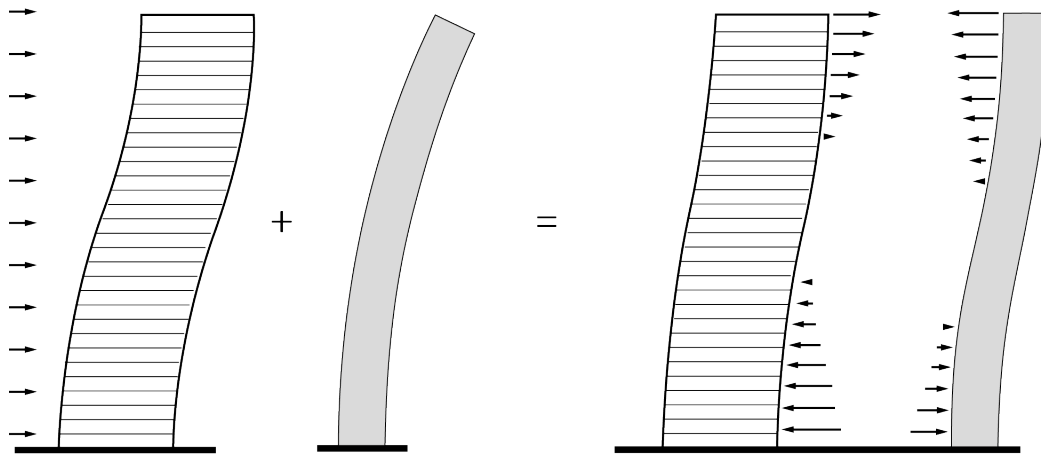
Shear wall-frame interaction forces due to restricted deformations[2]
